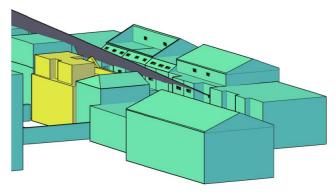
25 degree line from the first floor windows of 78-86 Camden Mews
